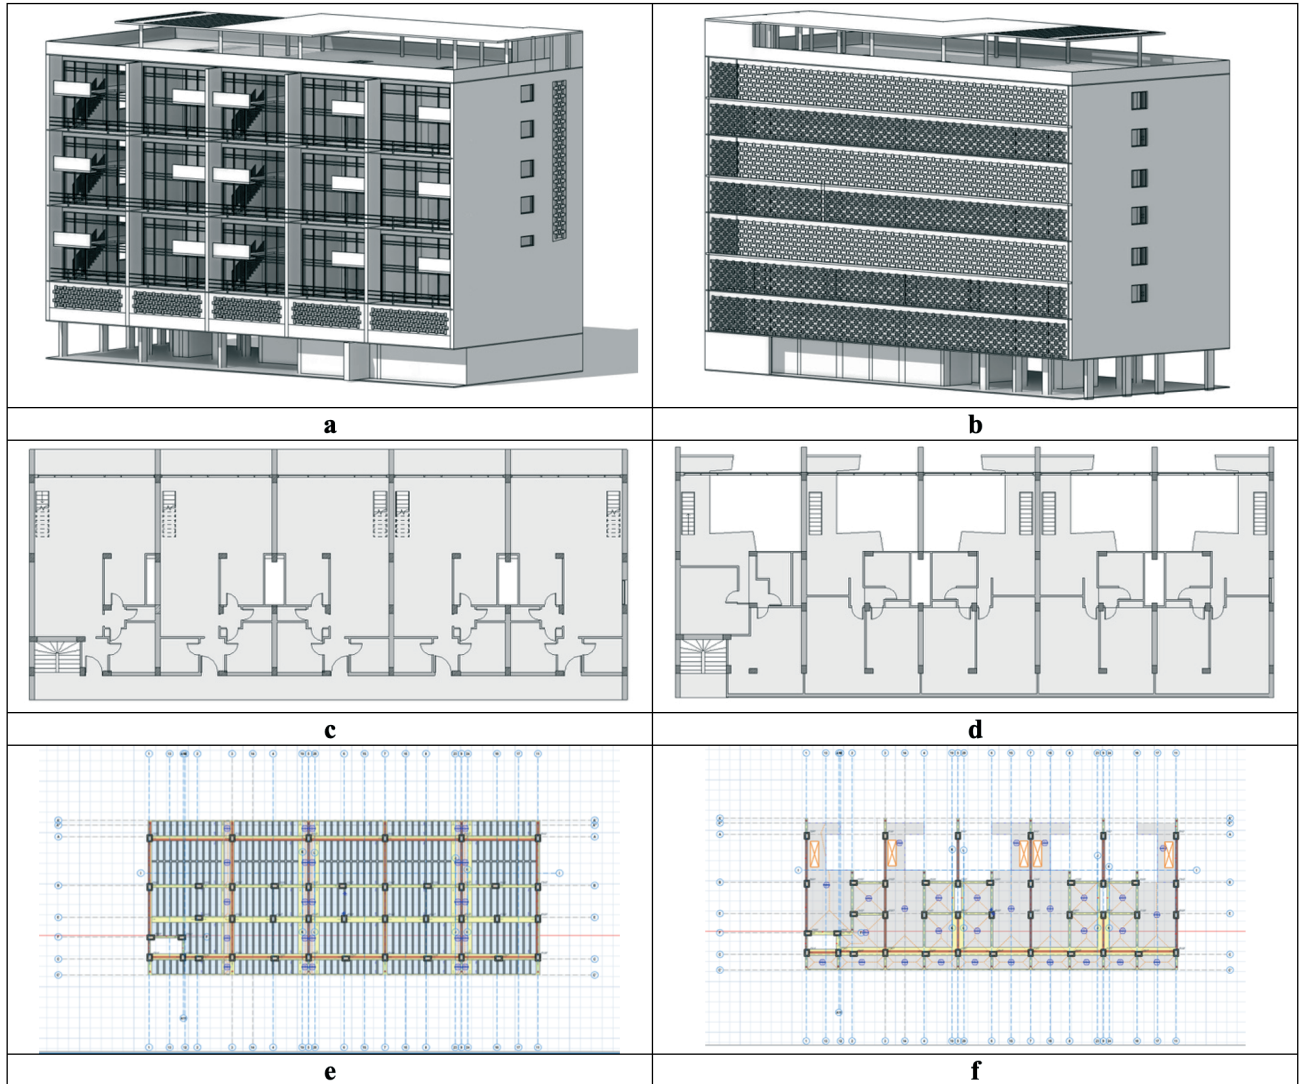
Model 1 – Current state: a. Perspective views from northwest façade. b. Perspective views from southeast façade. c. Residential unit's entrance floor plan. d. Residential unit's mezzanine floor plan. e. Residential unit's entrance floor ProtaStructure model. f. Residential unit's mezzanine floor ProtaStructure model (3-D images are produced by authors via Autodesk Revit Software; 2-D images are produced via ProtaStructure Software).
